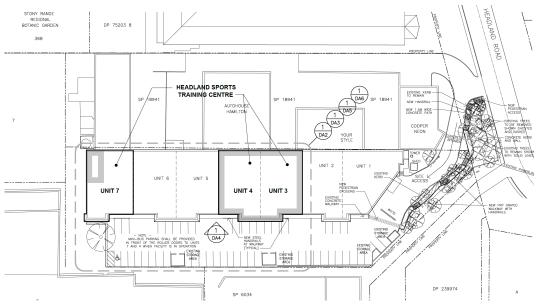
Extract from approved site plan (DA-01) prepared by studio djgeenen
